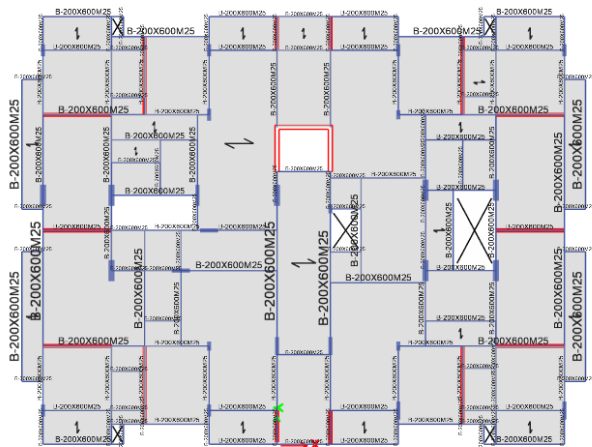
RCC With Shear Walls Typical plan layout from ETABS.
